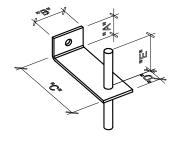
"L" STRAP W/ WELDED DOWEL PINS @ JAMB
